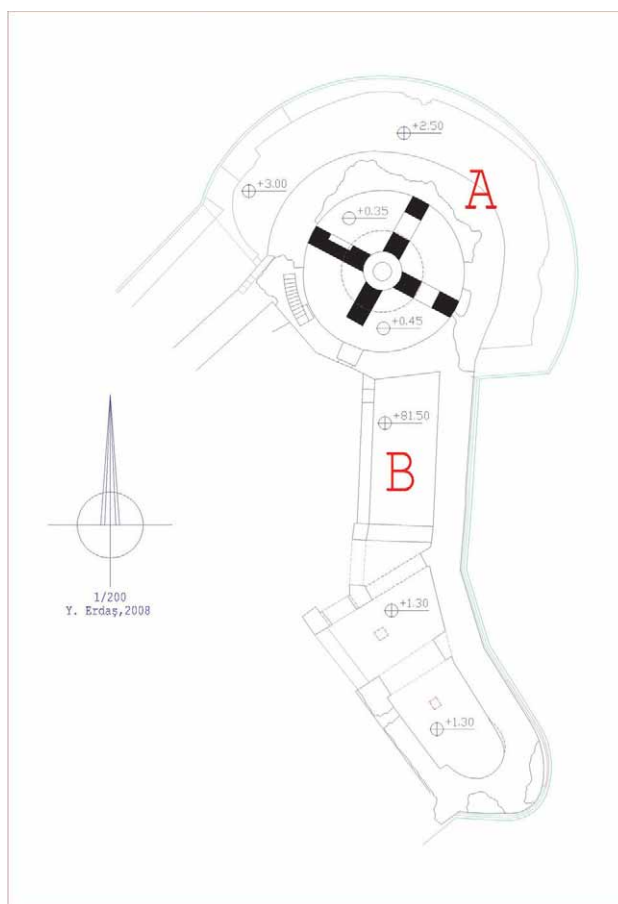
Plan, after excavation (Y. ERDAŞ 2008)
